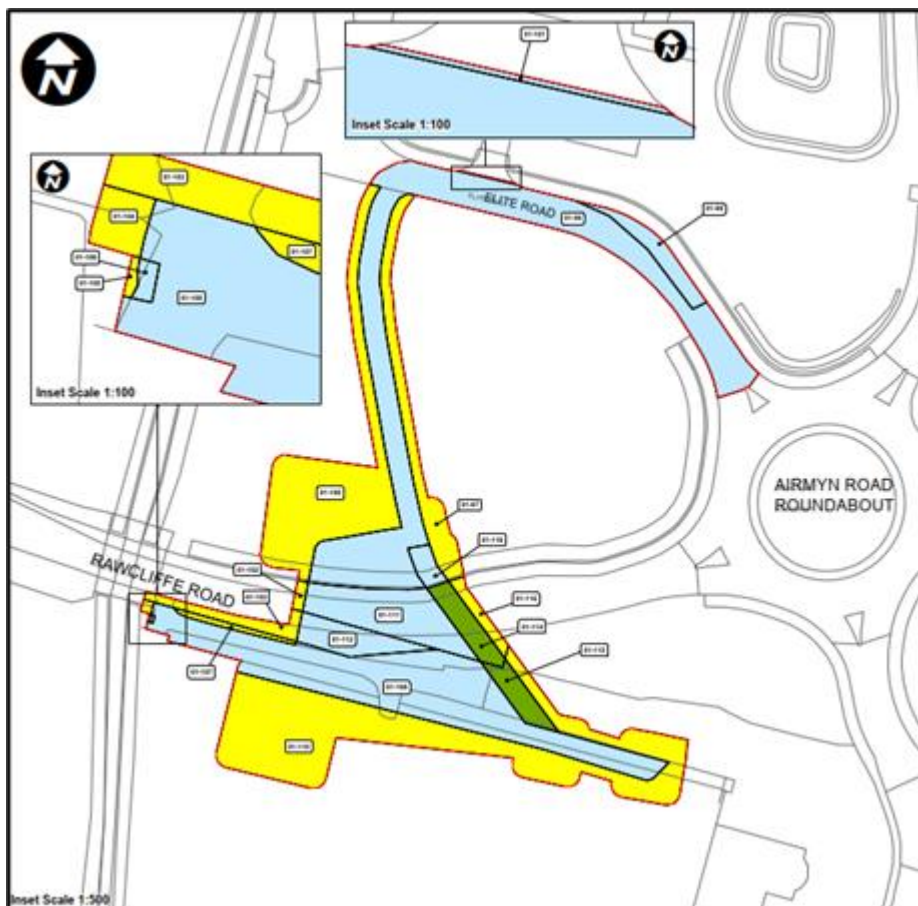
Extract from Current Land Plan for OHL2 Works - Plan 2.2 – Rev 02, Sheet 04
